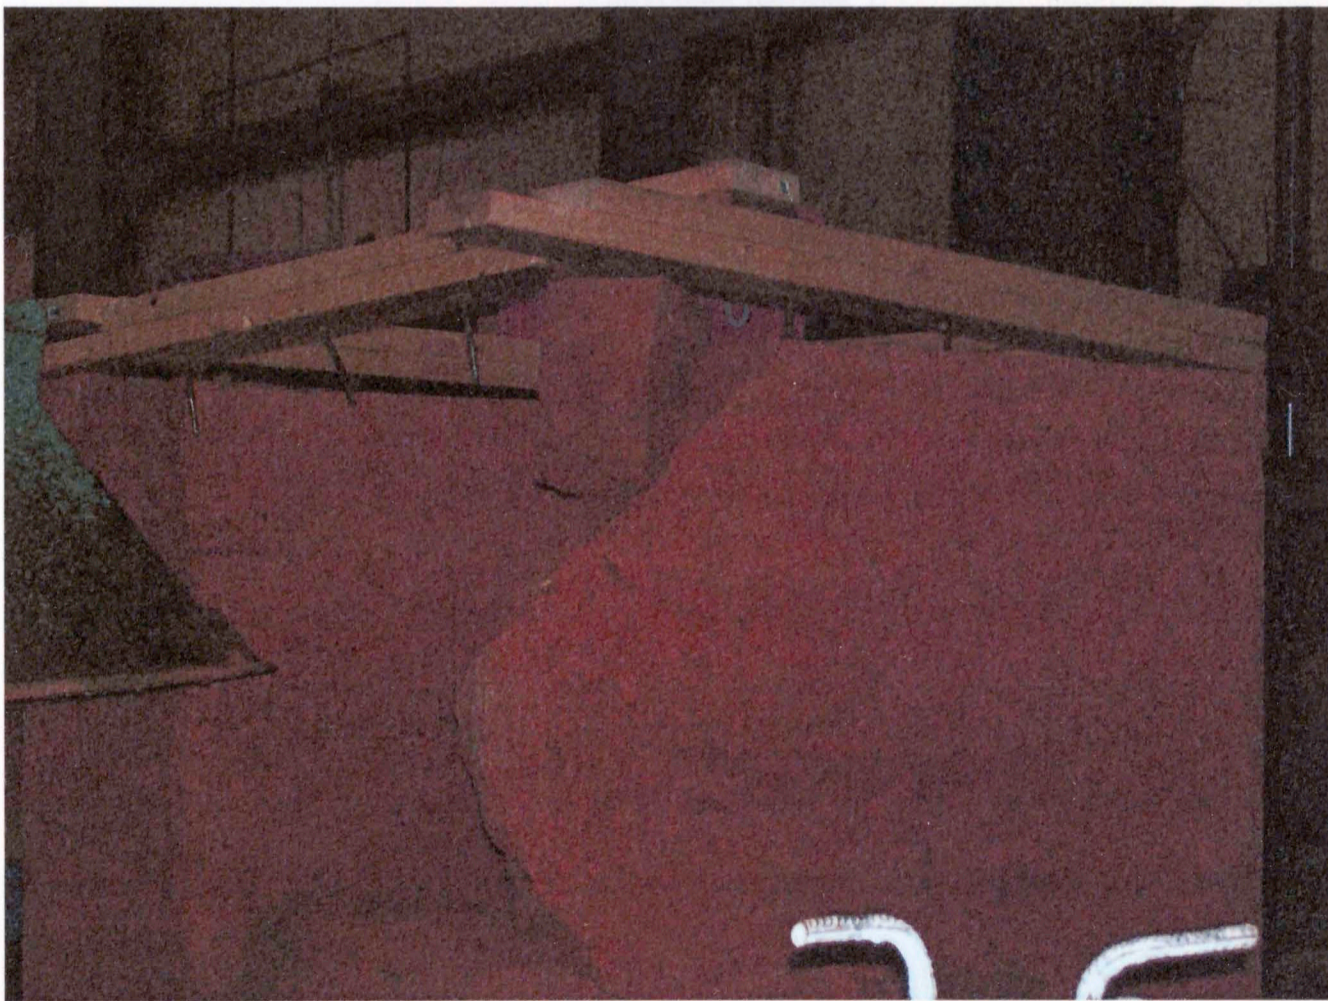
Test 3 view of suspended rammed earth at ring beam
